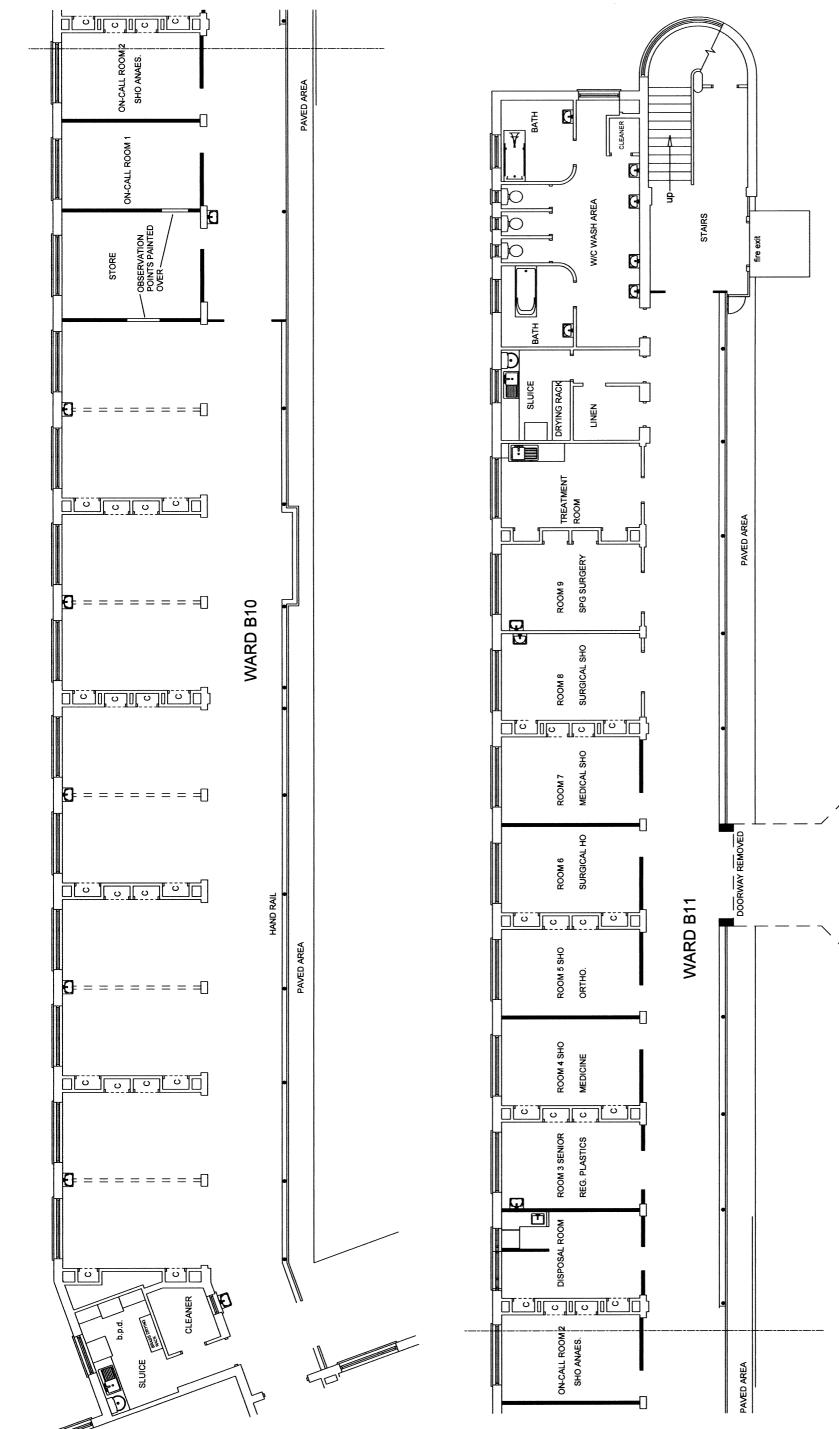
Original first floor east wing plan (scale approx. 1:450)
